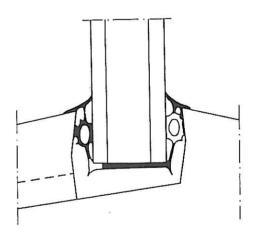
U-shaped gasket mounted on a sealed glazing unit
